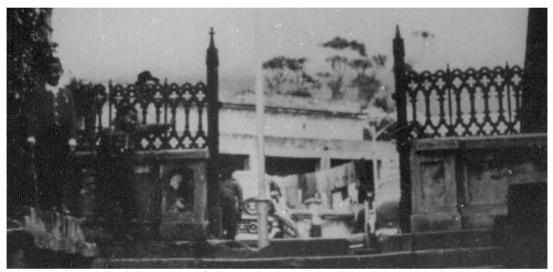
Detail of the view of the Welgelgen dwelling from Caledon Street up the Vernon Terrace stairs. The original dwelling is visible as a mono-pitched structure. The more recent addition to the front of the NW portion is visible just behind the washing line. The brick portion of Wall III is also visible (between the two parked cars). (CA AG 17604)
